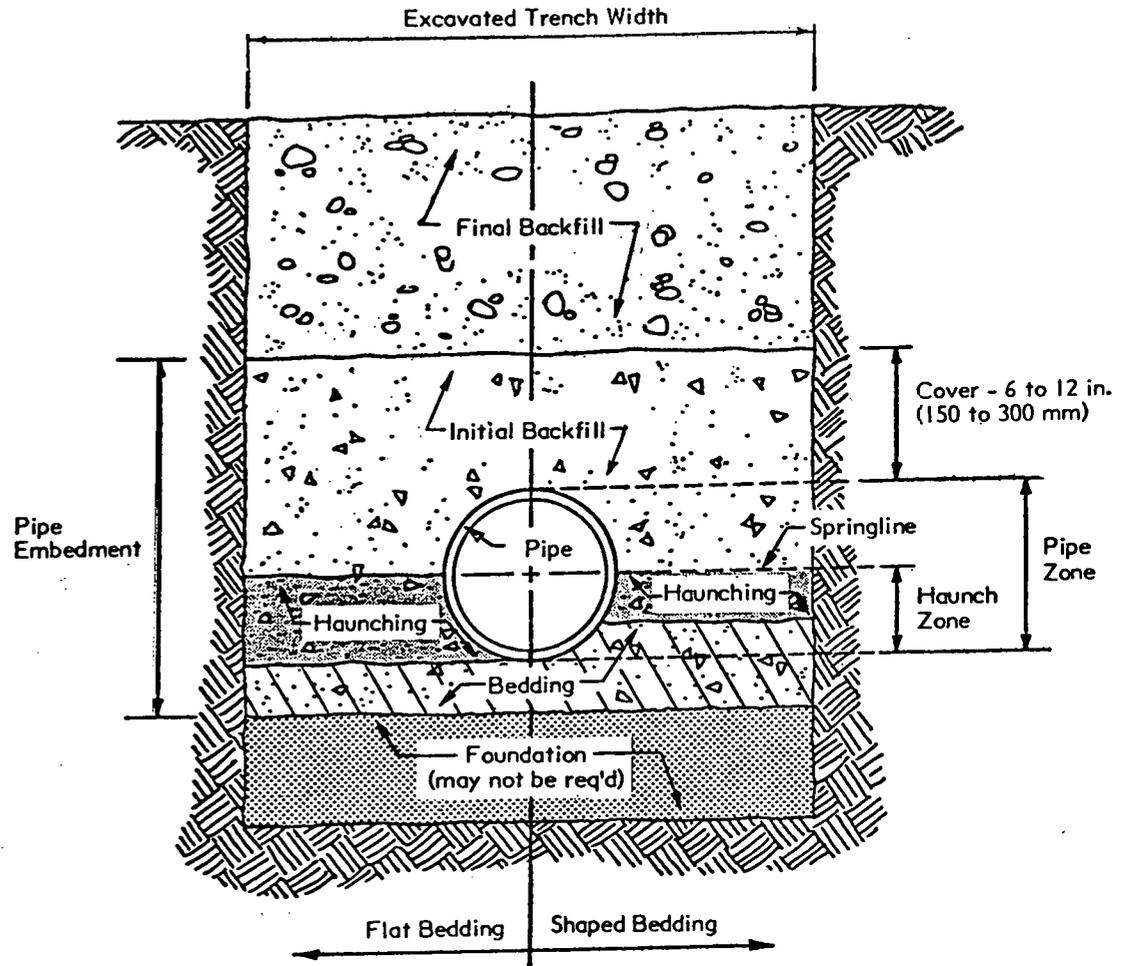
TRENCH CROSS SECTION SHOWING TERMINOLOGY
